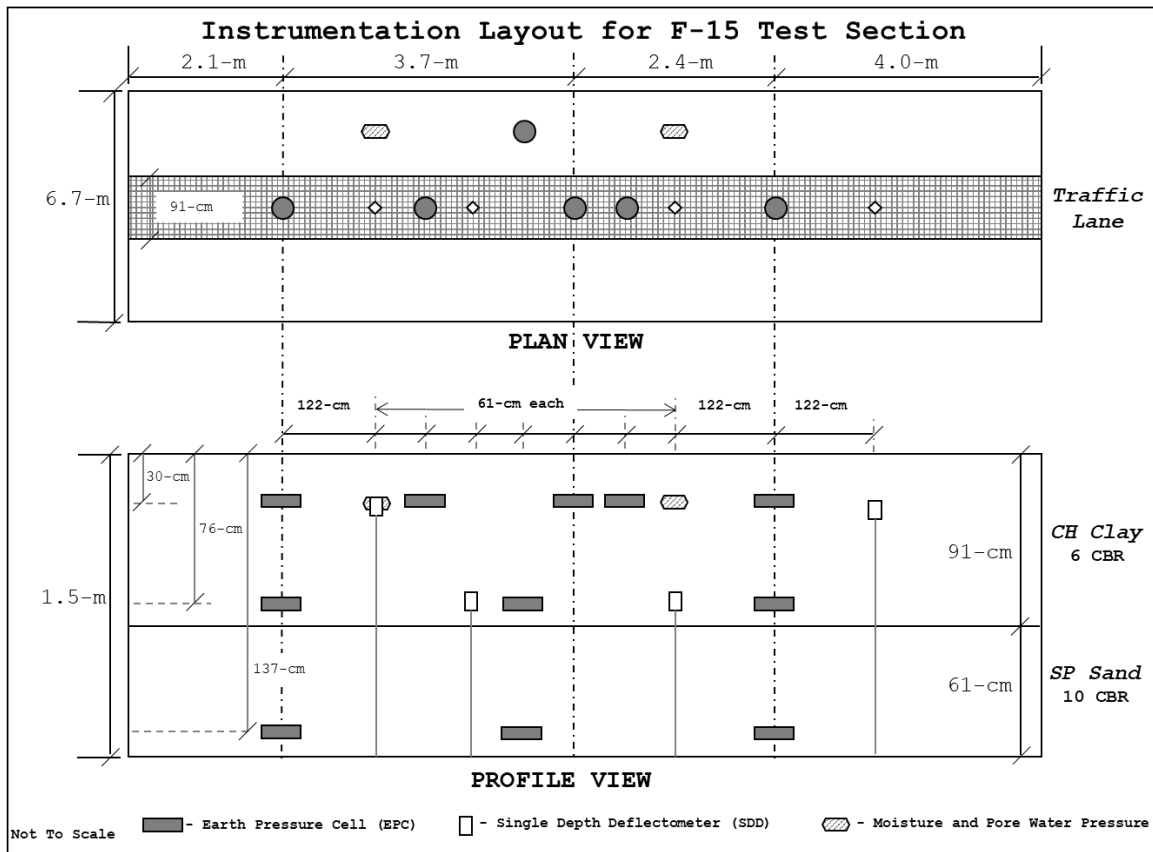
Full-scale test section instrumentation layout for F-15 (after Rushing and Tingle 2007)
